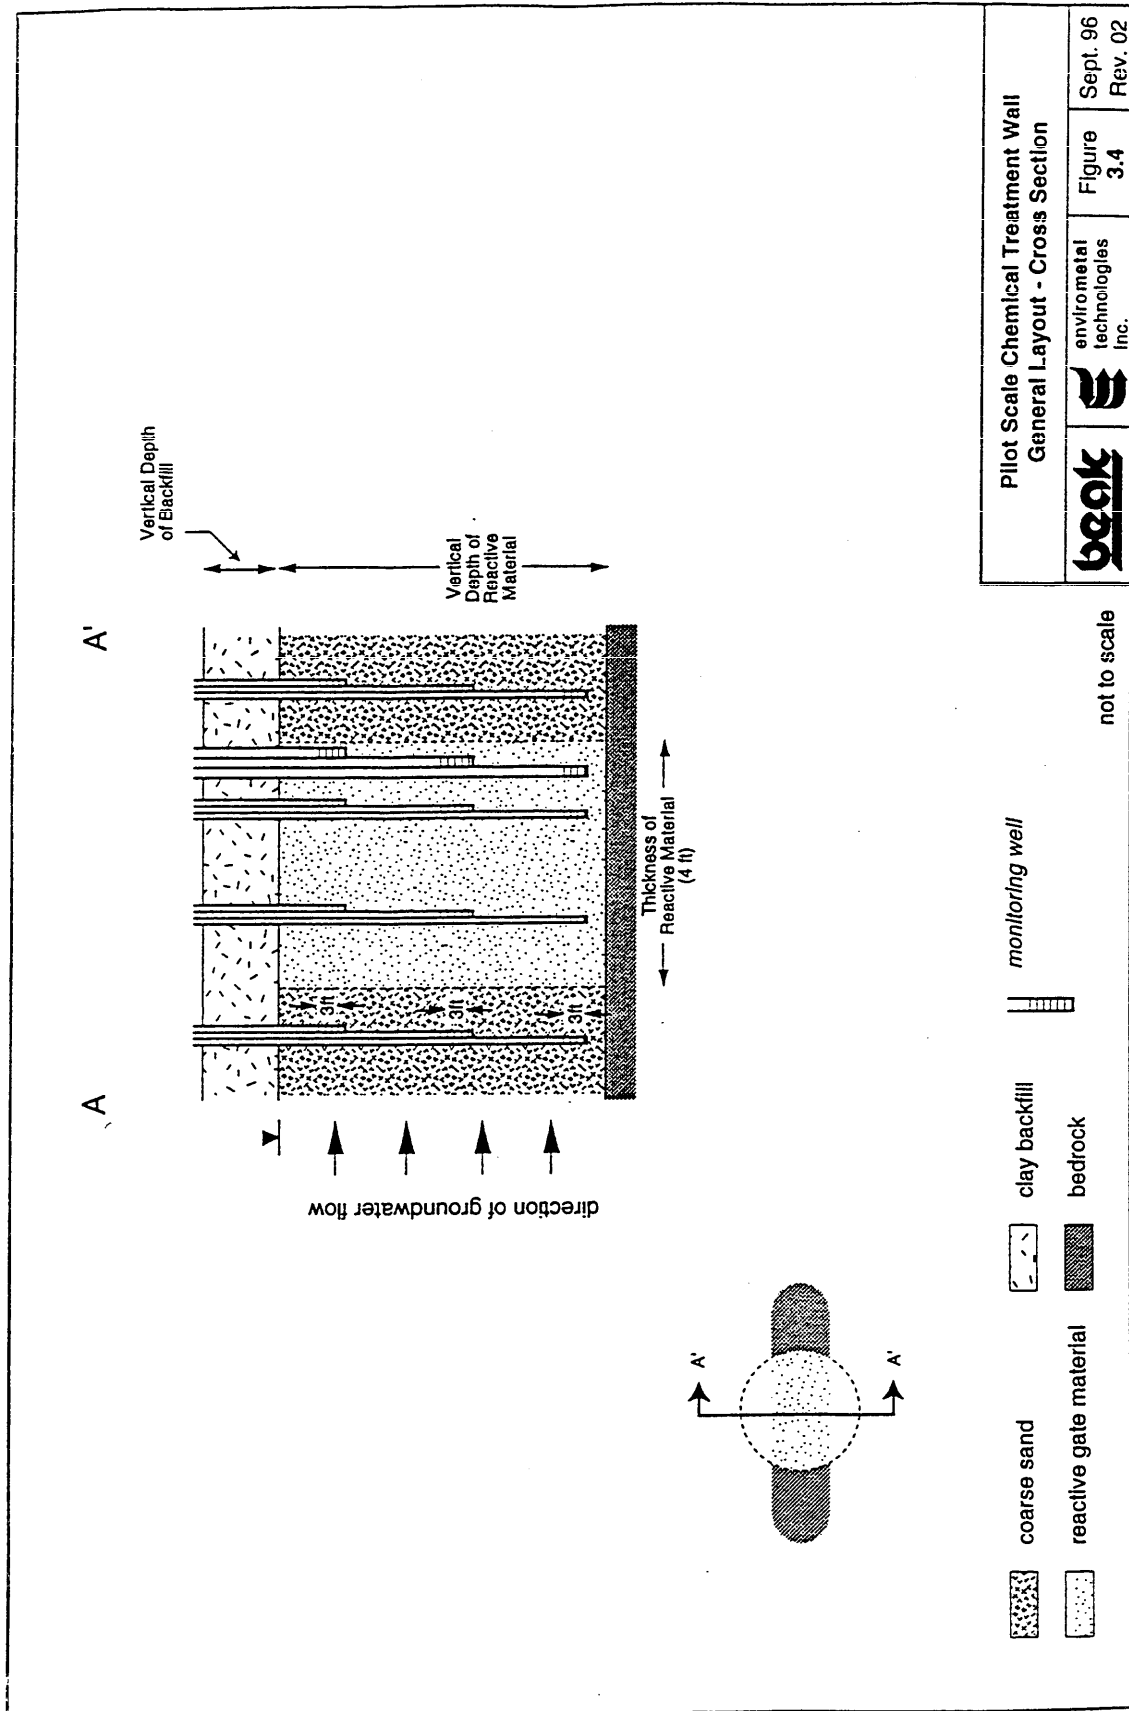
Design Plan for the Permeable Barrier Installed at the Somersworth Sanitary Landfill, NH – Cross-Sectional View (ETI, 1996)
